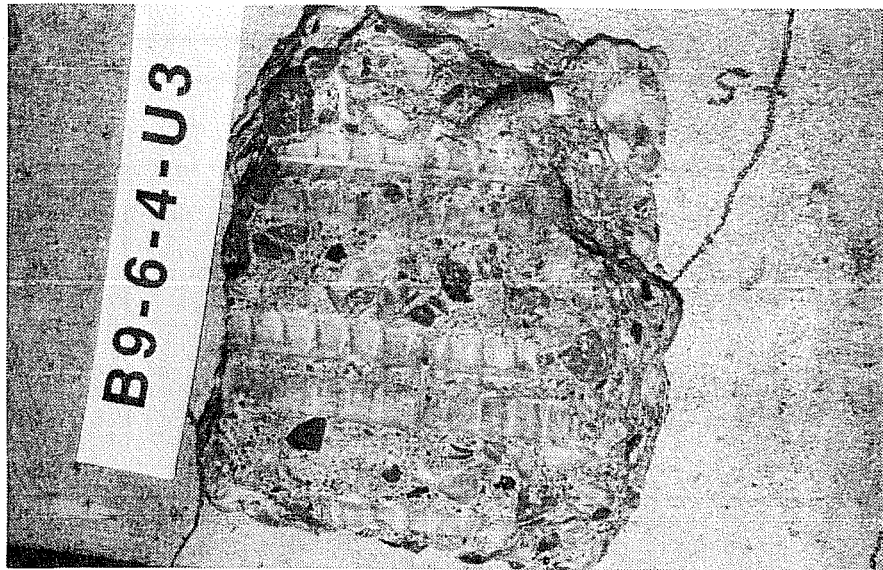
Concrete cover after splice failure, uncoated bars.
